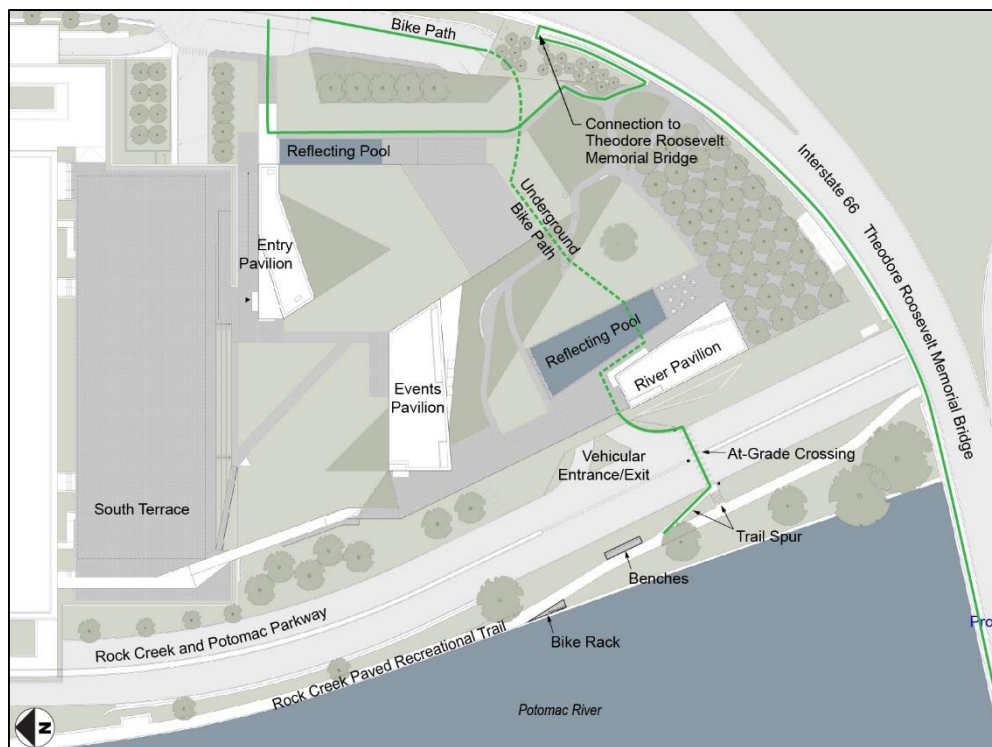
At-Grade Crossing Access Alternative, plan view (not to scale) showing the proposed bicycle route (in green) from the Rock Creek Paved Recreation Trail through the site of the Expansion Project.
